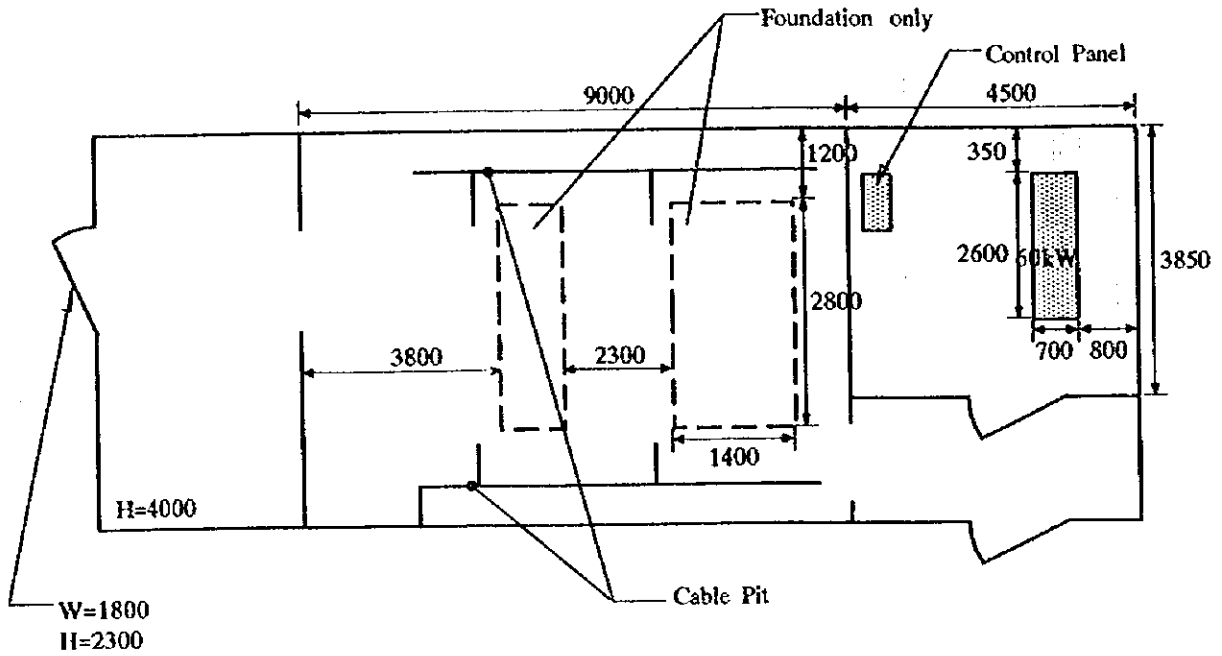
7 Layout Drawing of Tsagaankhairkhan
